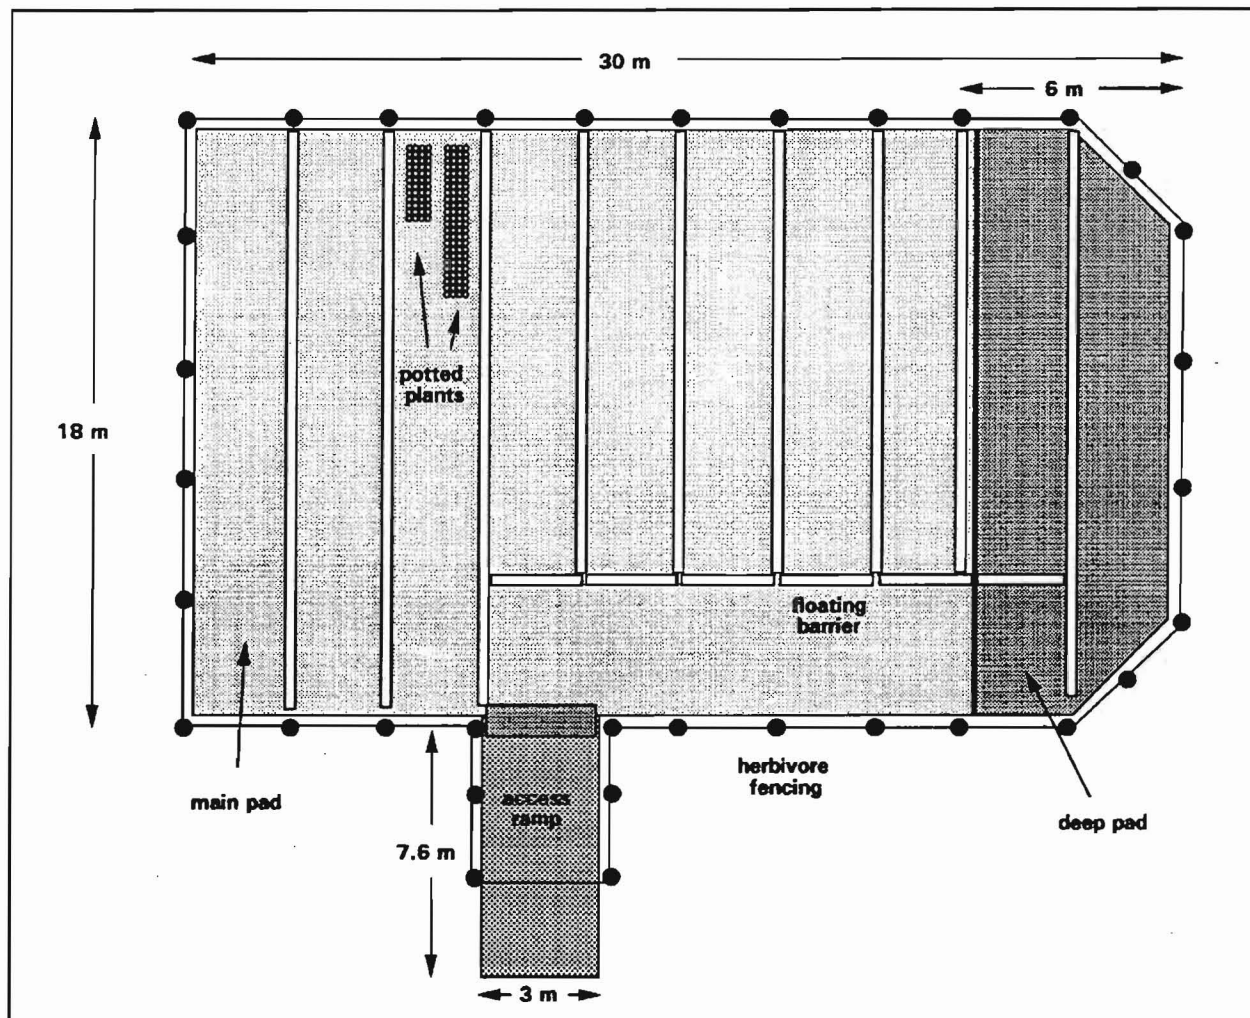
A large, concrete grow-out pad has been constructed in Pond 45 and serves as a cultivation site for study plants (After establishment in containers, plants are moved to tanks to begin studies. Barriers are present in grow-out pond to reduce herbivory and prevent cross-contamination of aquatic plant species)
